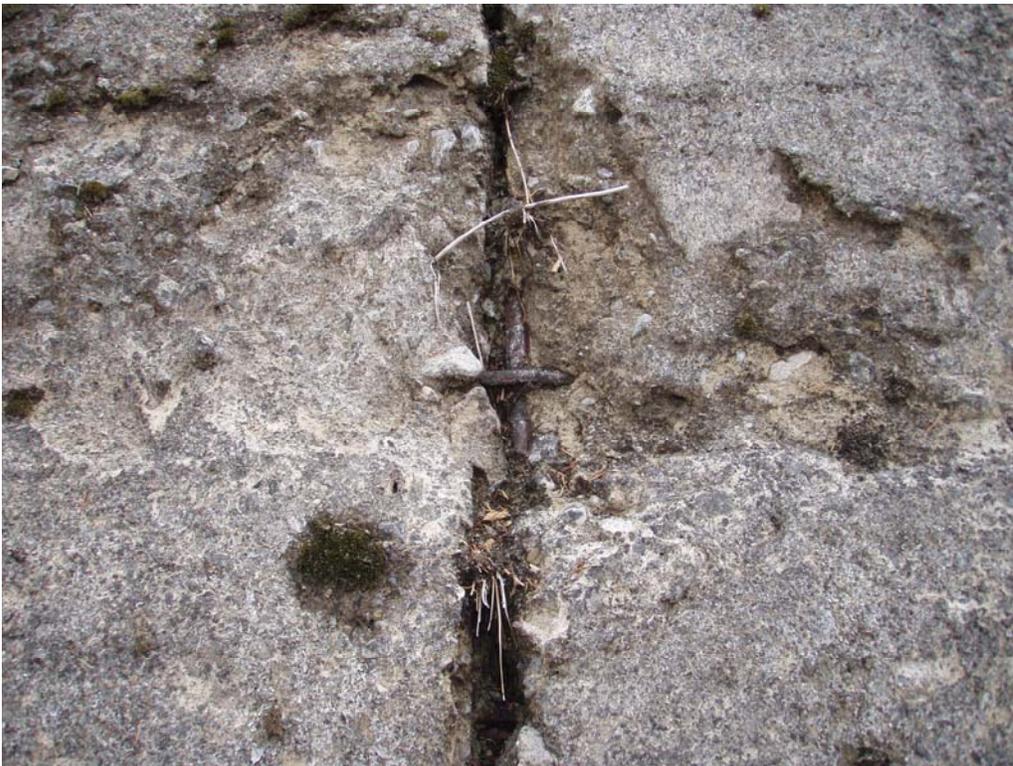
Horizontal Cracking on Spillway Floor.
